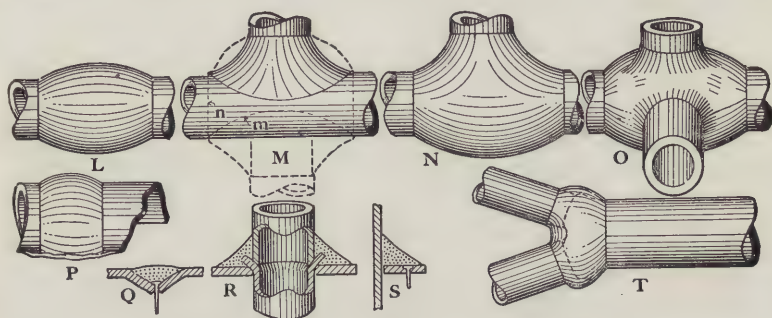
WIPE JOINTS, FLANGES, SEAMS, ETC.
